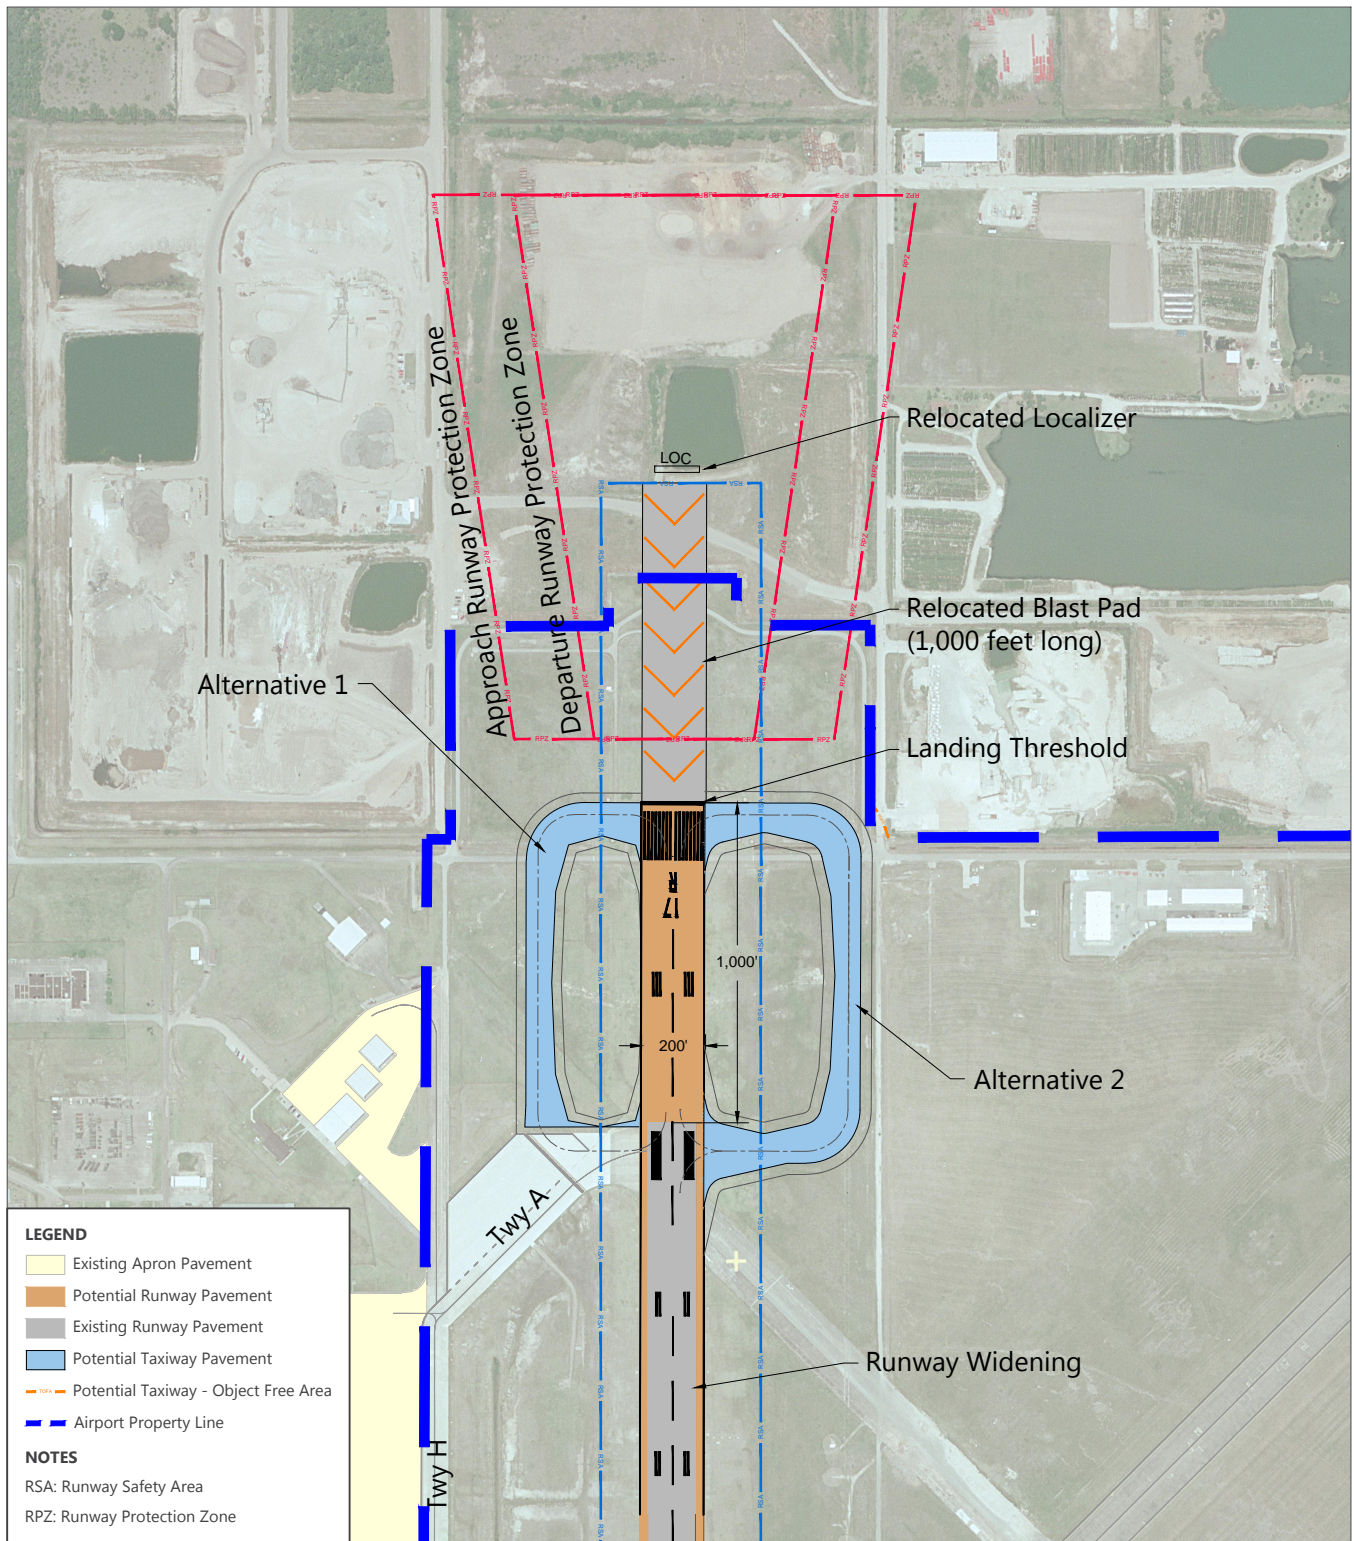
depicts two taxiway alternatives providing access to the extended Runway 17R end. Alternative 1 shows an extension of existing Taxiway H, on the west side of the runway, with a perpendicular taxiway connector to the runway end. Similarly to existing Taxiway H, the taxiway extension would meet ADG IV taxiway-to-object separation standards. The runway-taxiway separation, however, would be reduced to the standard of 400 feet to avoid impacting the ANG hangars located to the northeast of existing Taxiway A. Taxiway access could be provided from the east side of the runway, as shown in Alternative 2. This alternative consists of building a parallel taxiway along the runway extension, on the east side, connecting with existing Taxiway A. The runway-to-taxiway separation would meet the ADG V standard of 400 feet.
